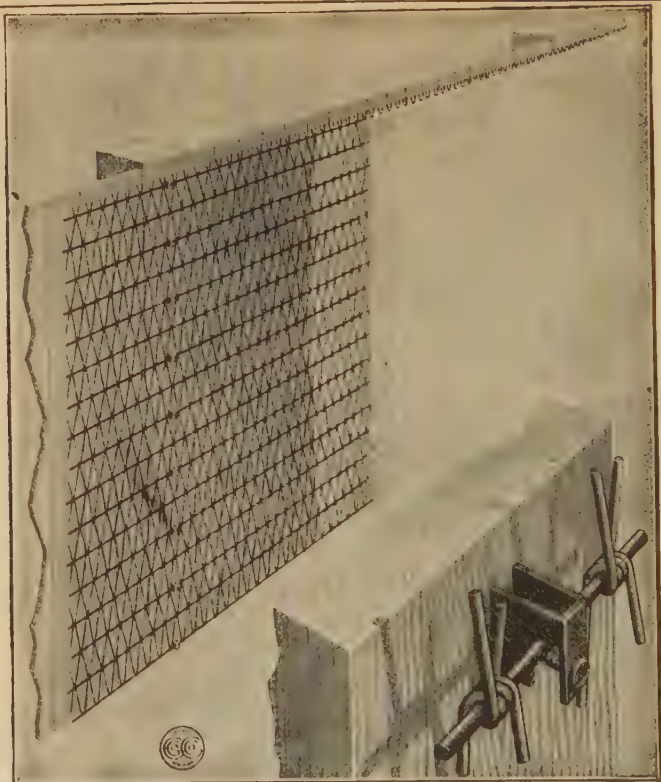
,050.—Columbian system showing method of placing the special form of Columbia bars on slabs, girders, and columns. This is a flat concrete system with ribbed steel tension member. Rolled joists are used for beams, embedded in concrete, the double cross floor reinforcement being held in place by flat iron inverted stirrups placed over the top flanges of the joists.
